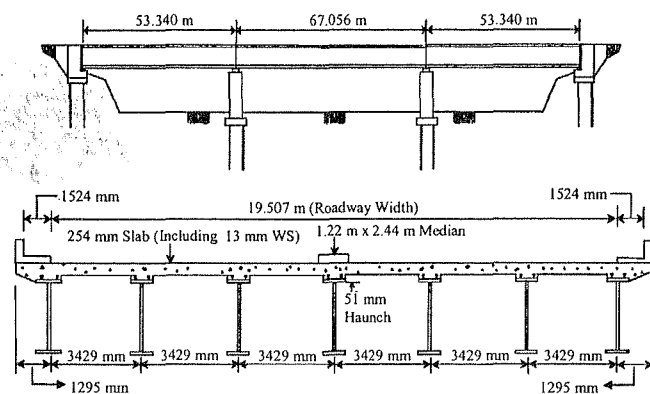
Bridge profile and cross section (adapted from Clingenpeel 2001)
